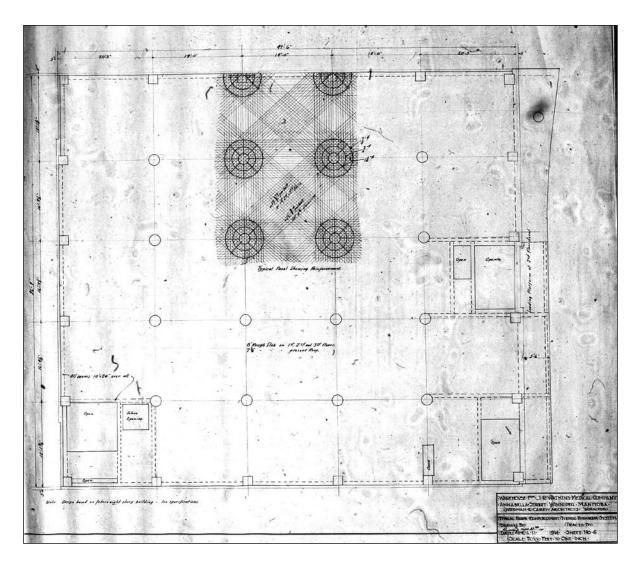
"Typical Floor Reinforcement Turner Mushroom System," Architect's Plans No. 2346/1914. (<u>City of Winnipeg</u>.)
